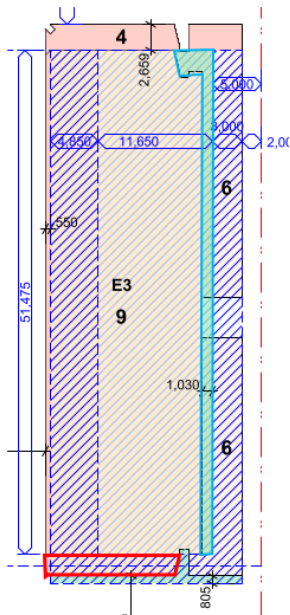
Plan of Building E3, with DCP exceedance outlined in red
